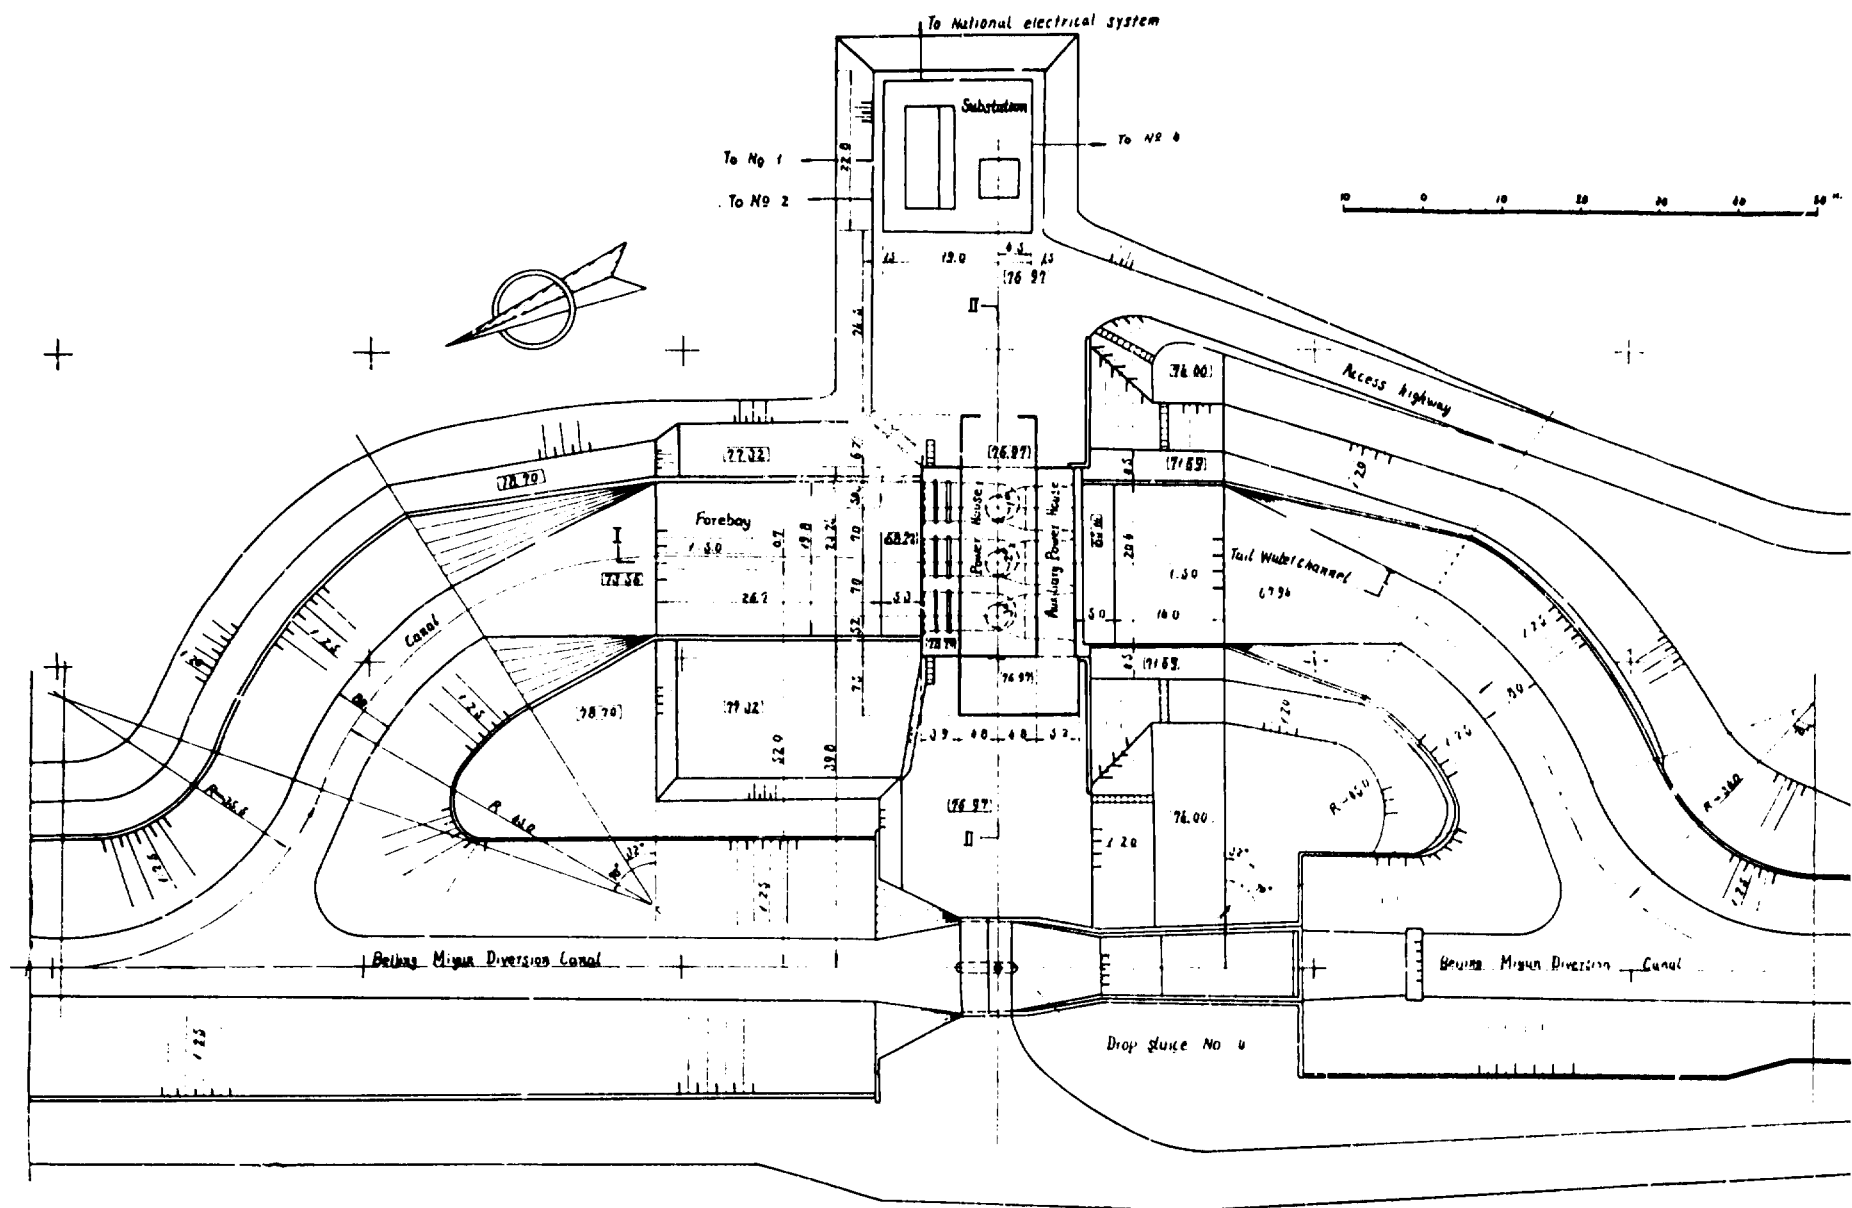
PLAN OF WATER POWER STATION NO.3 ON BEIJING - MIMYUN CANAL
